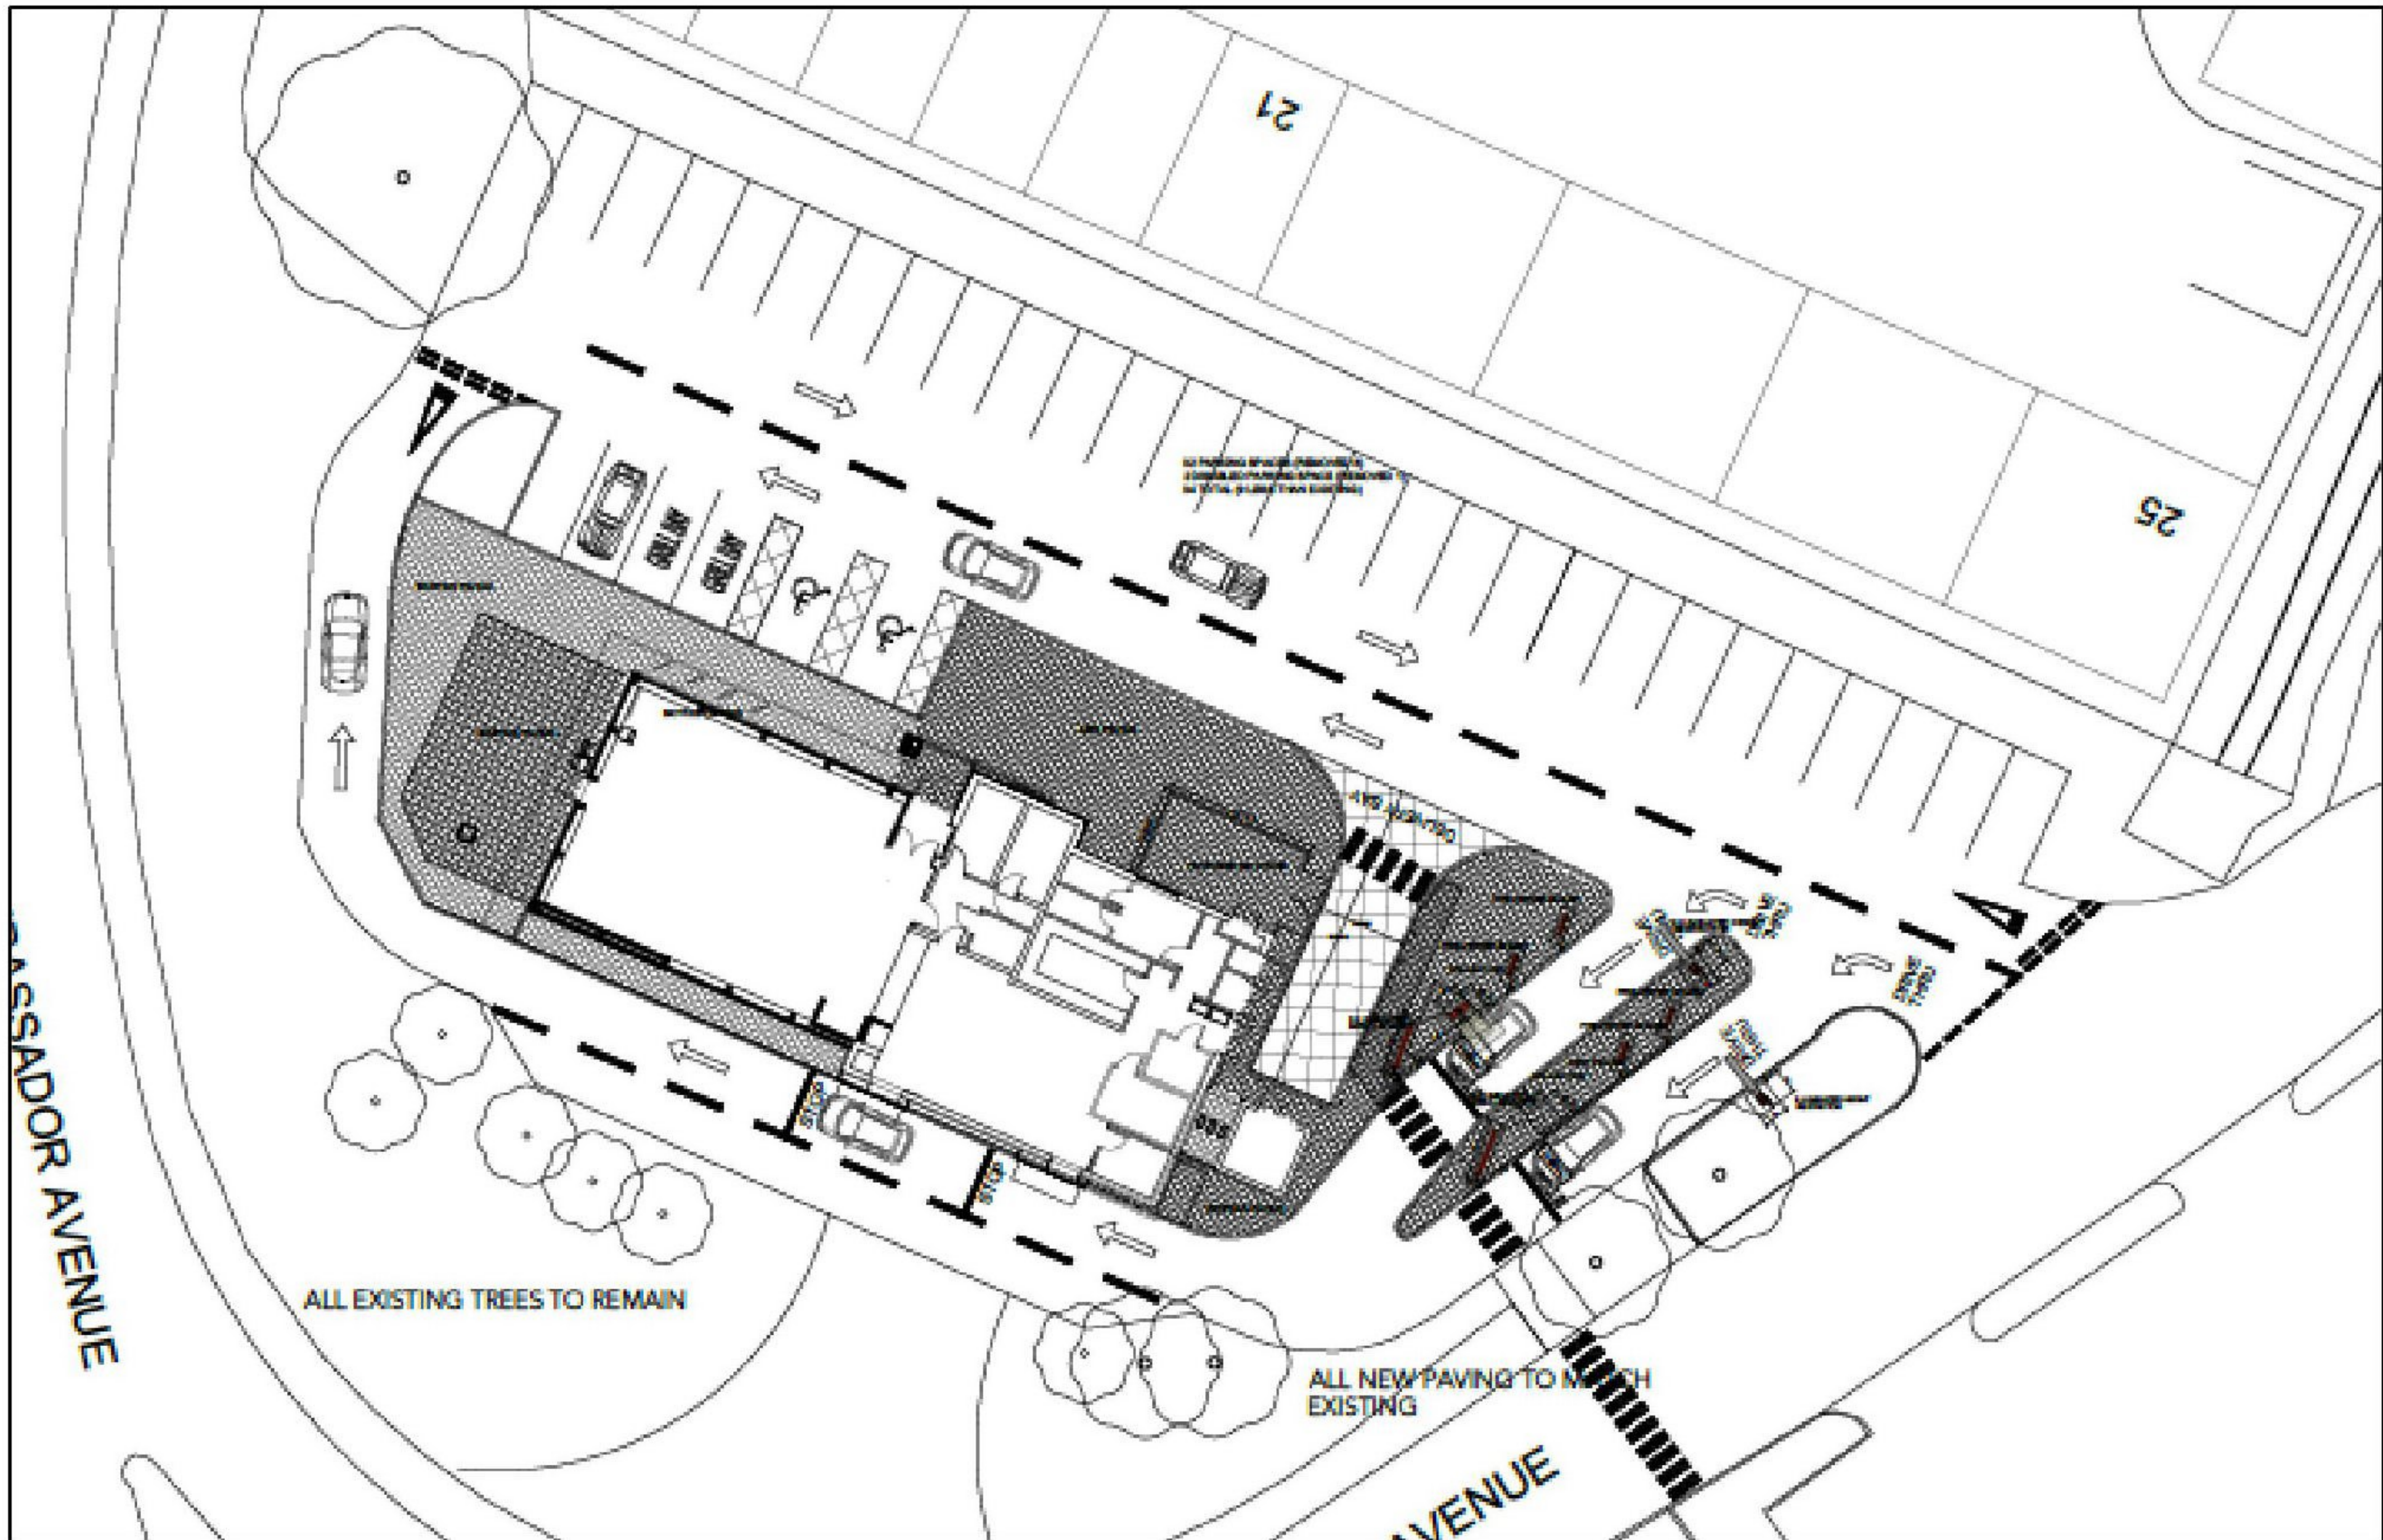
Extract of Proposed Site Plan illustrating application proposals.
